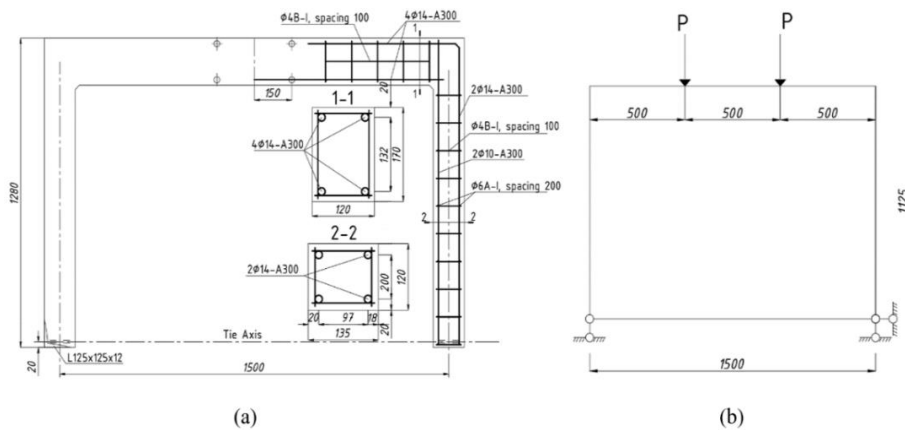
U-shaped frame: reinforcement scheme (a), calculation scheme (b)
